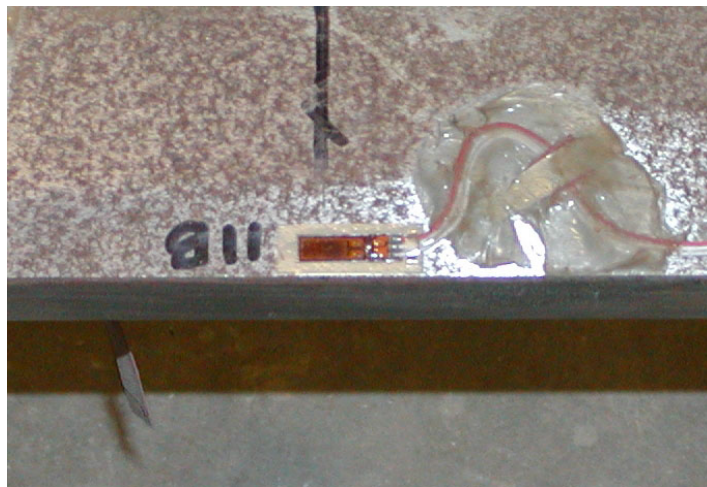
Electrical resistance gage spot-welded to steel section
